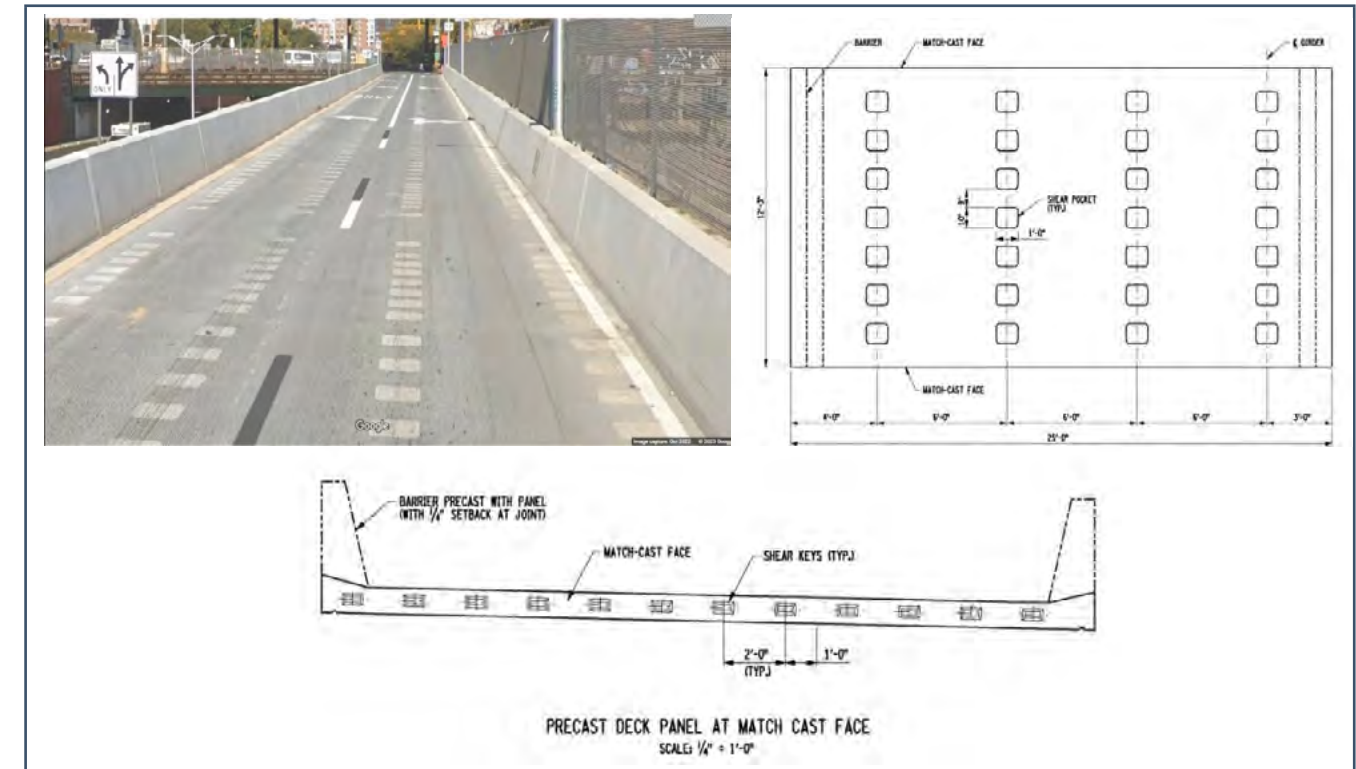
A proprietary precast deck system called AccelBridge™ implemented by New York State DOT
